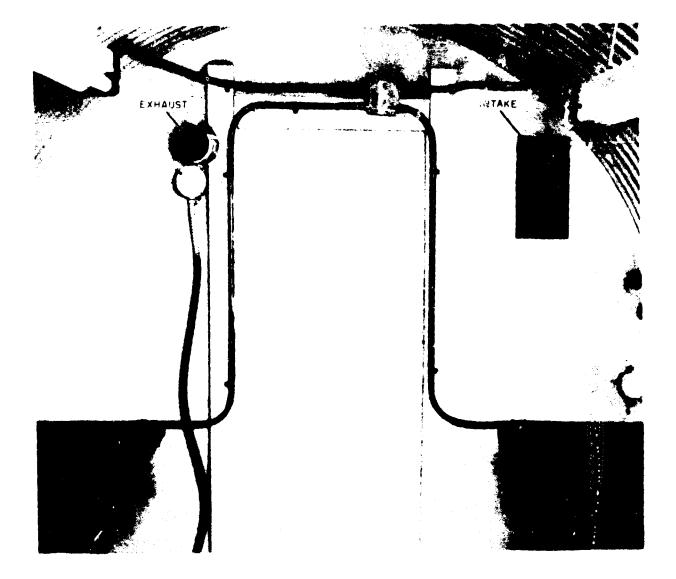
A View of Shelter Area Showing Access Door and Benches (looking Forward). The rectangular aperature on the right is the ventilation intake; the exhaust duct is to the left of the door.
